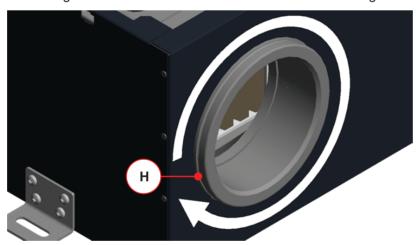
Shortening of the EPP connection stub at the set point of sectioning of the circumferential groove  ${\bf H}$
